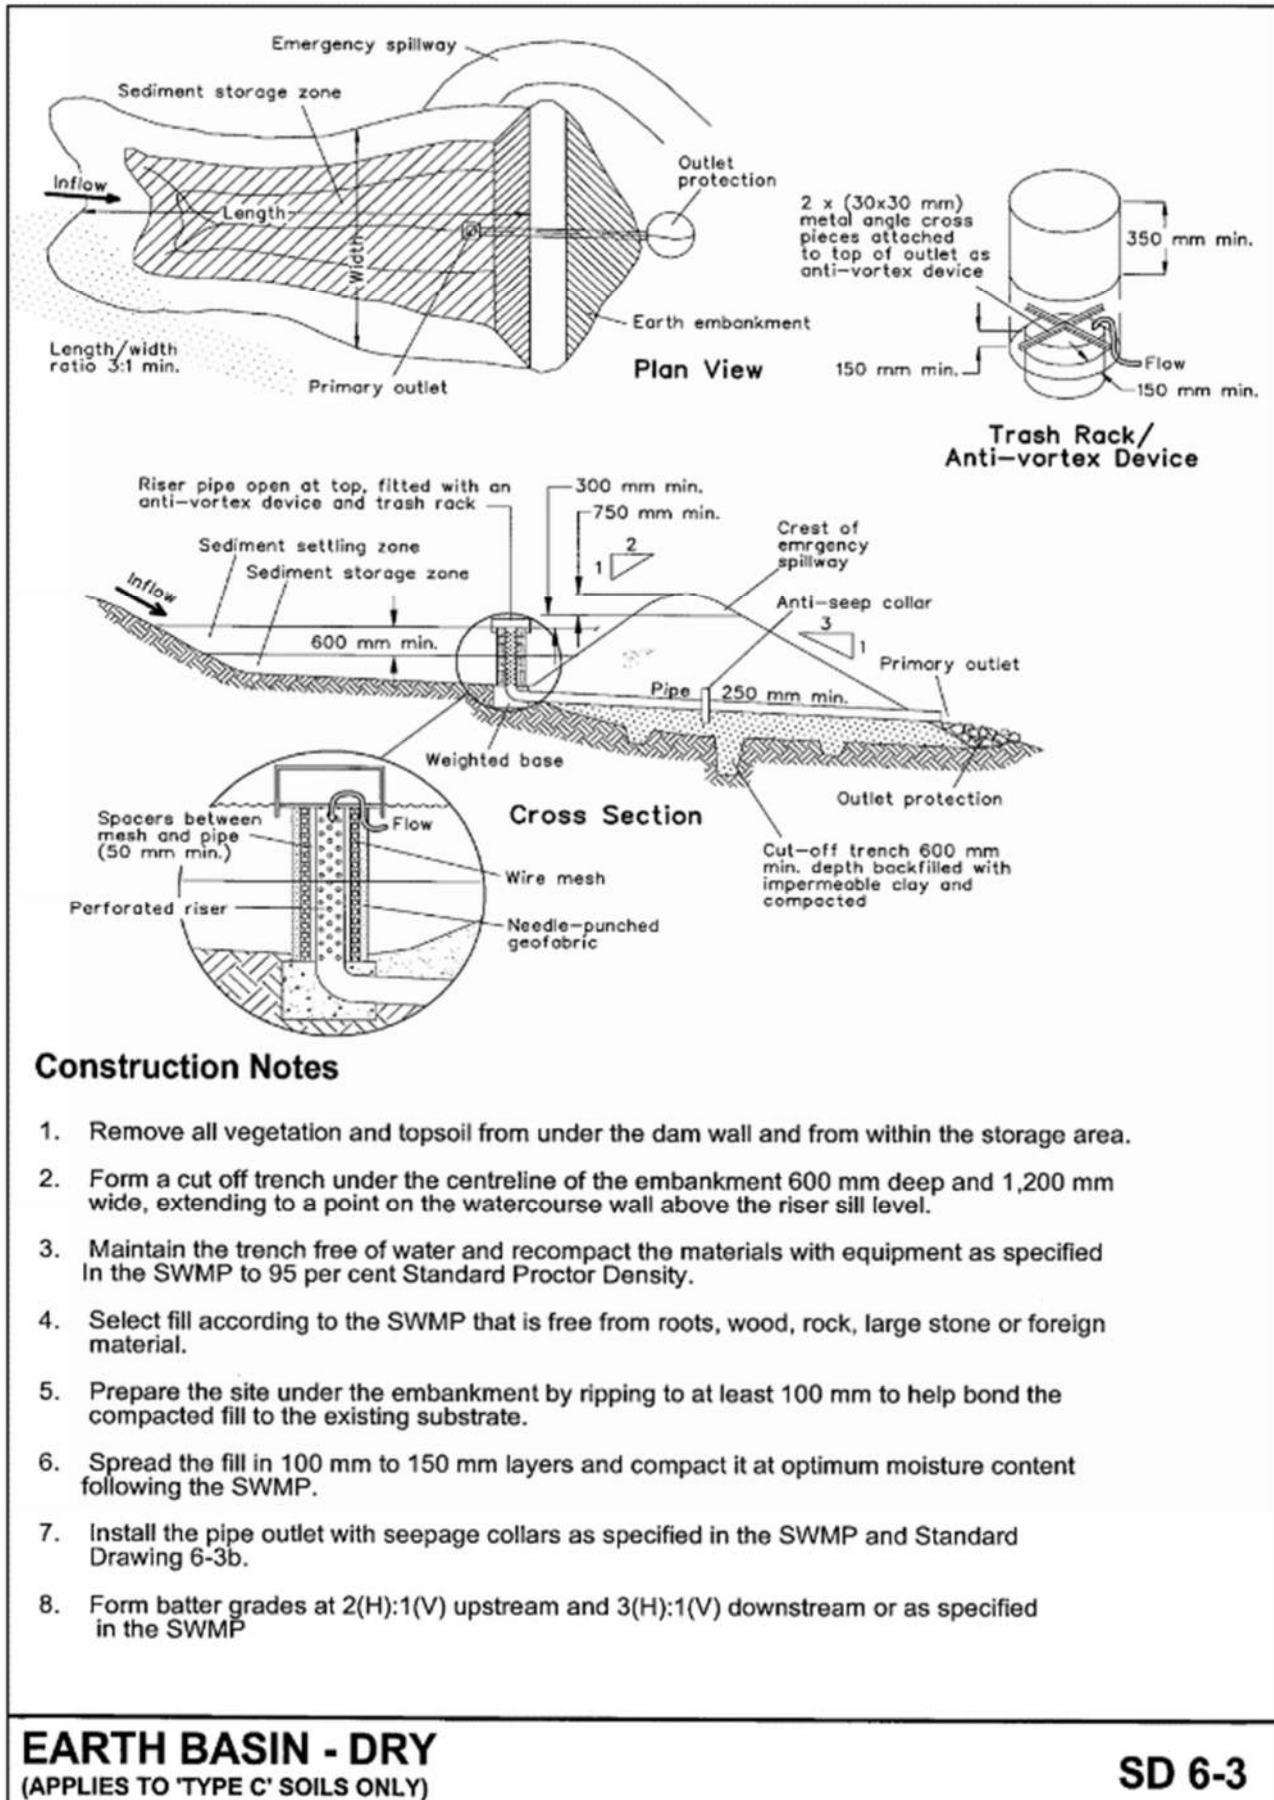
Typical dry earth sediment basin detail (Managing Urban Stormwater)
